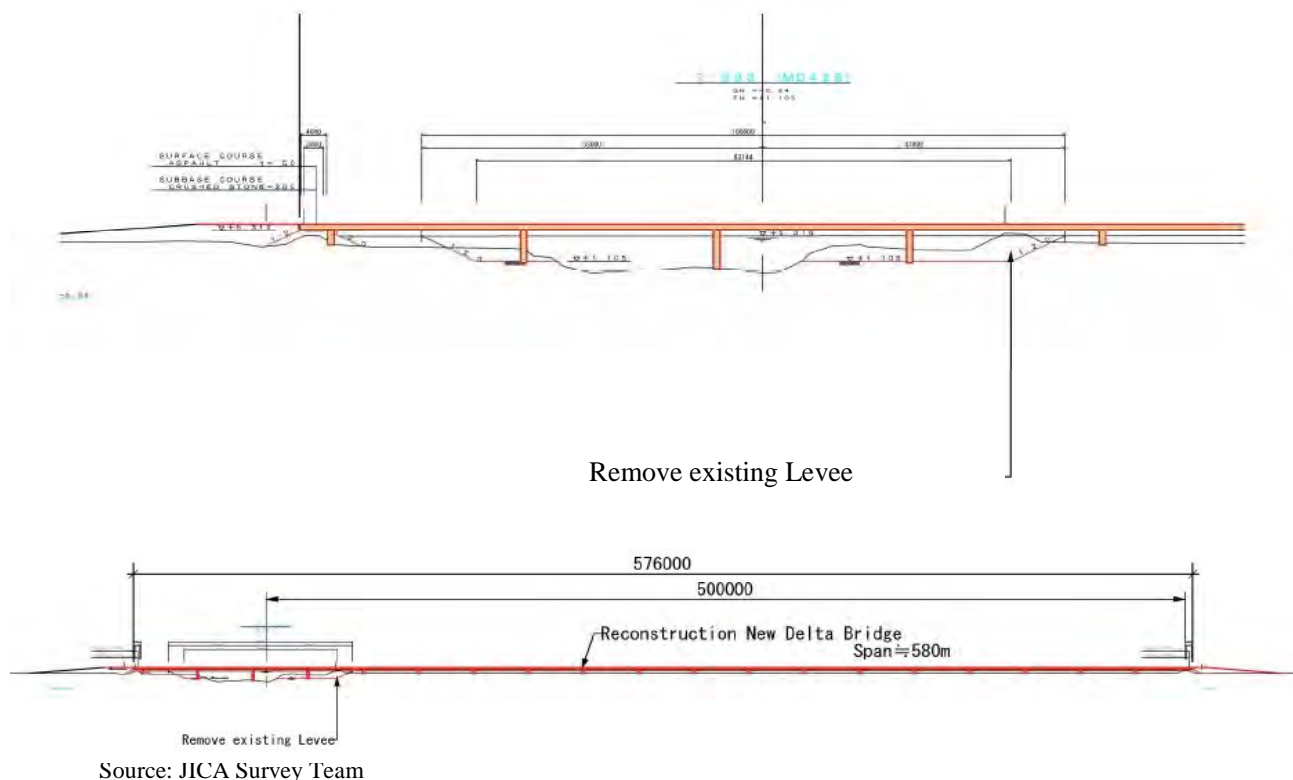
K. Landaous Bridge Reconstruction Specifications
